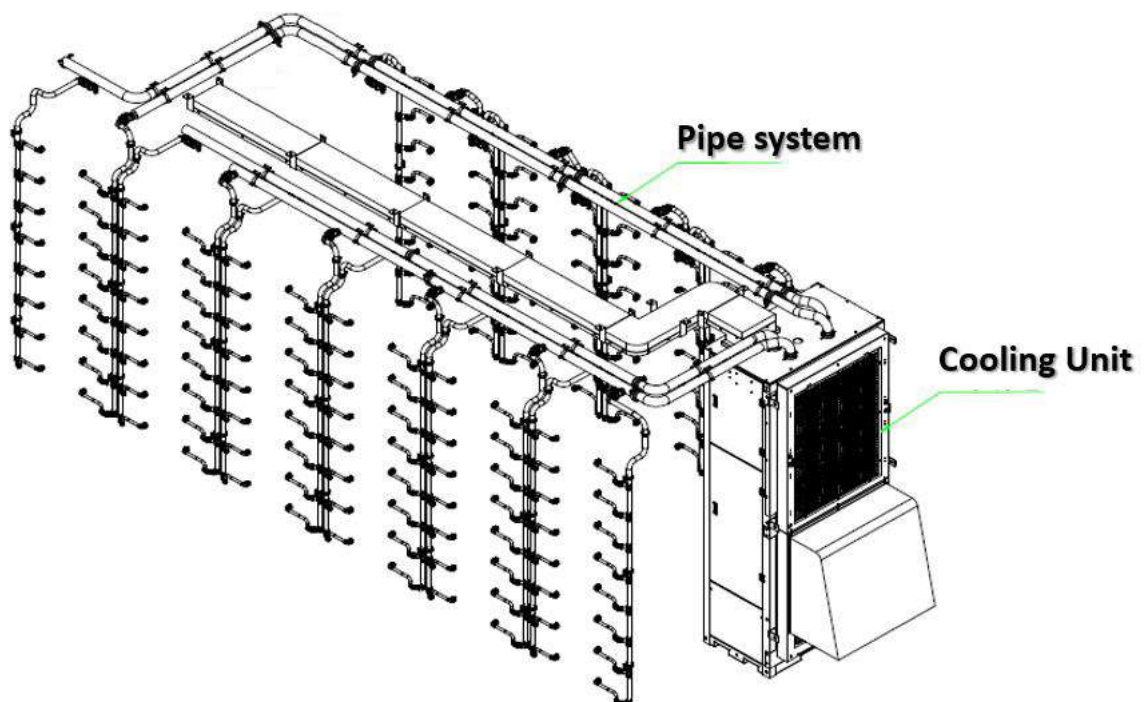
Liquid Cooling Pipe Layout (For reference)
